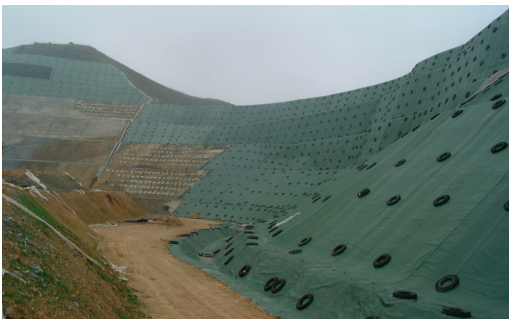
Completed reinforced fill embankment on the side facing the waste.
